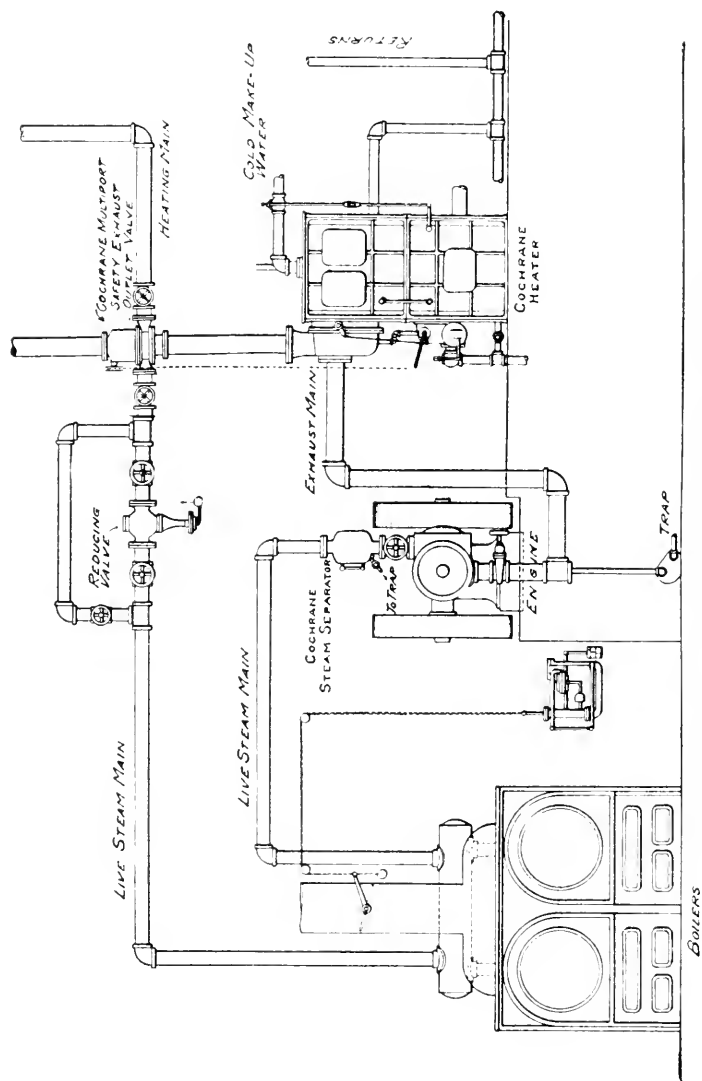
ARRANGEMENT OF EXHAUST STEAM HEATING SYSTEM
